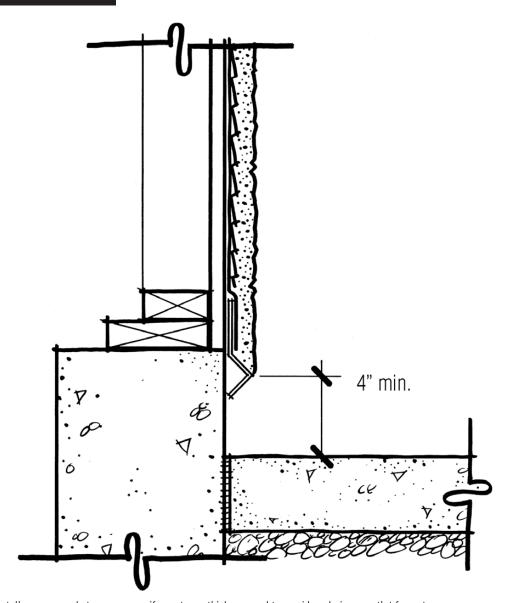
## FIGURE: DRAINAGE PLANE FOR SYNTHETIC STUCCO
